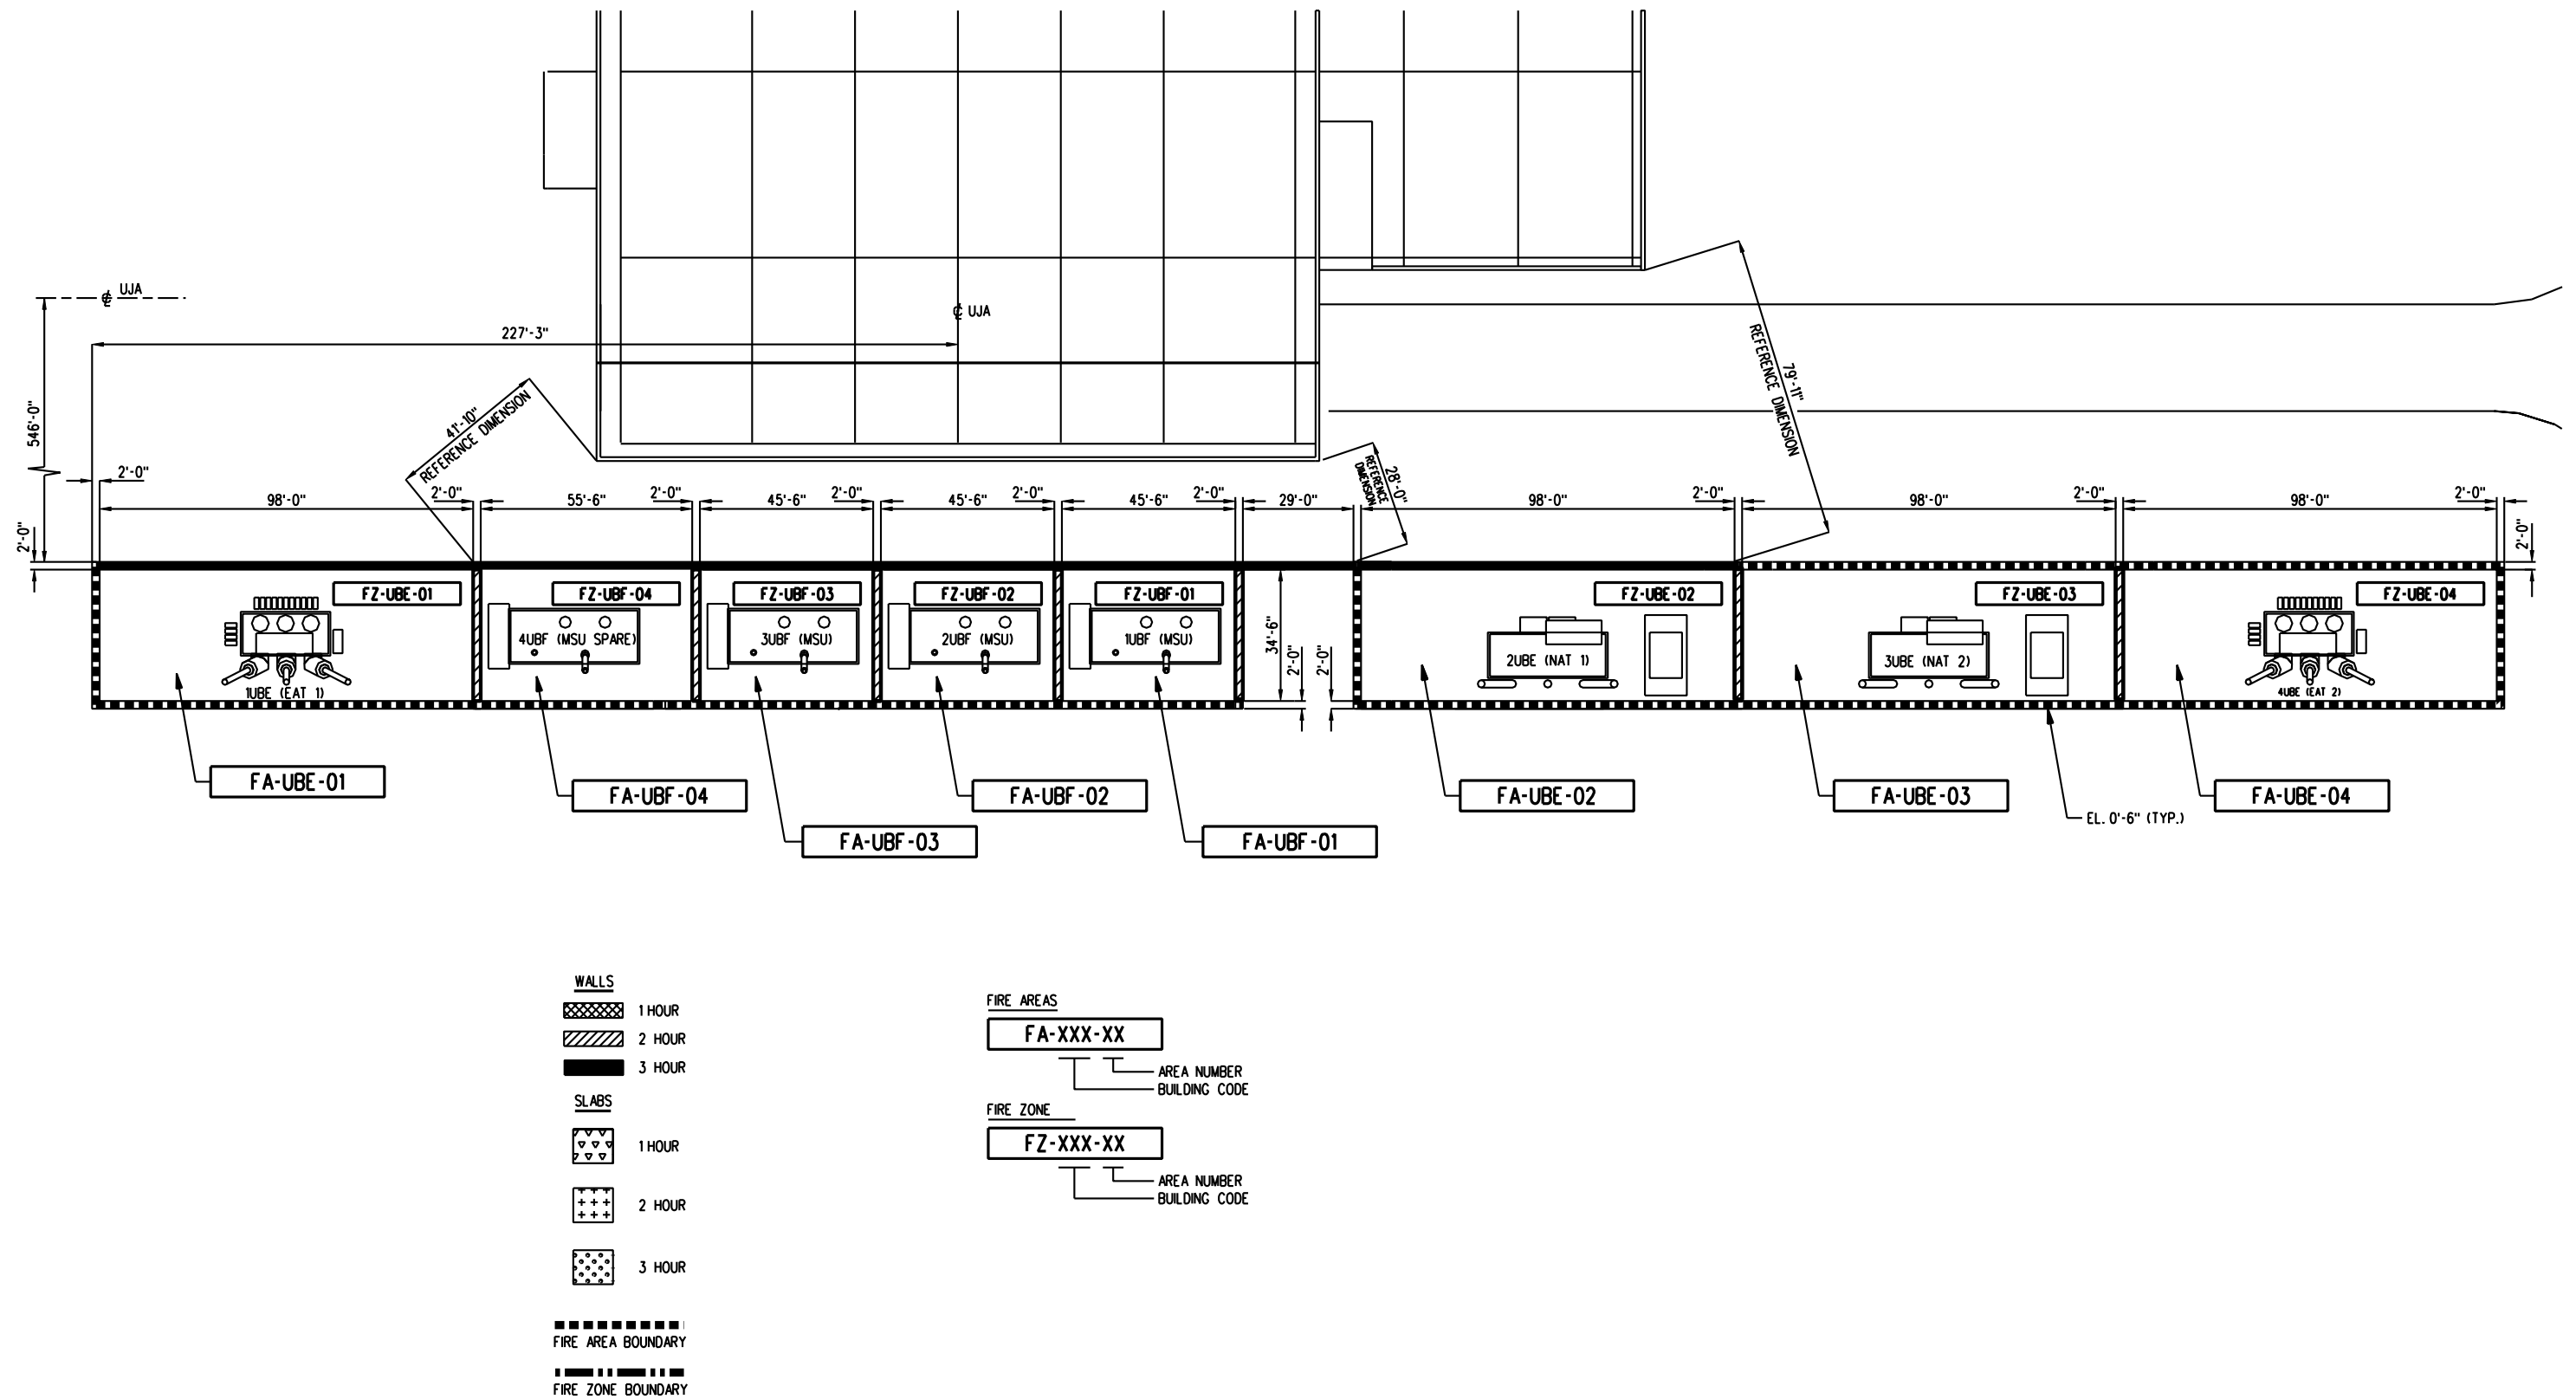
B-16 — CCNPP Unit 3 Fire Barrier Location, Warehouse Building Plan View at Elevation 85'-0"
